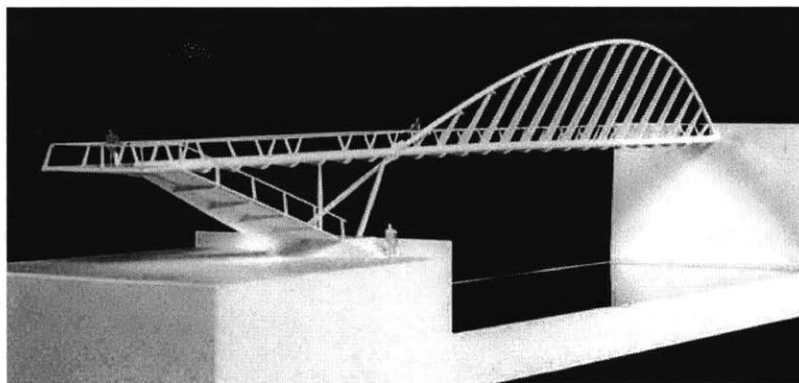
Model of the original project of La Devesa Footbridge with steel arch support
